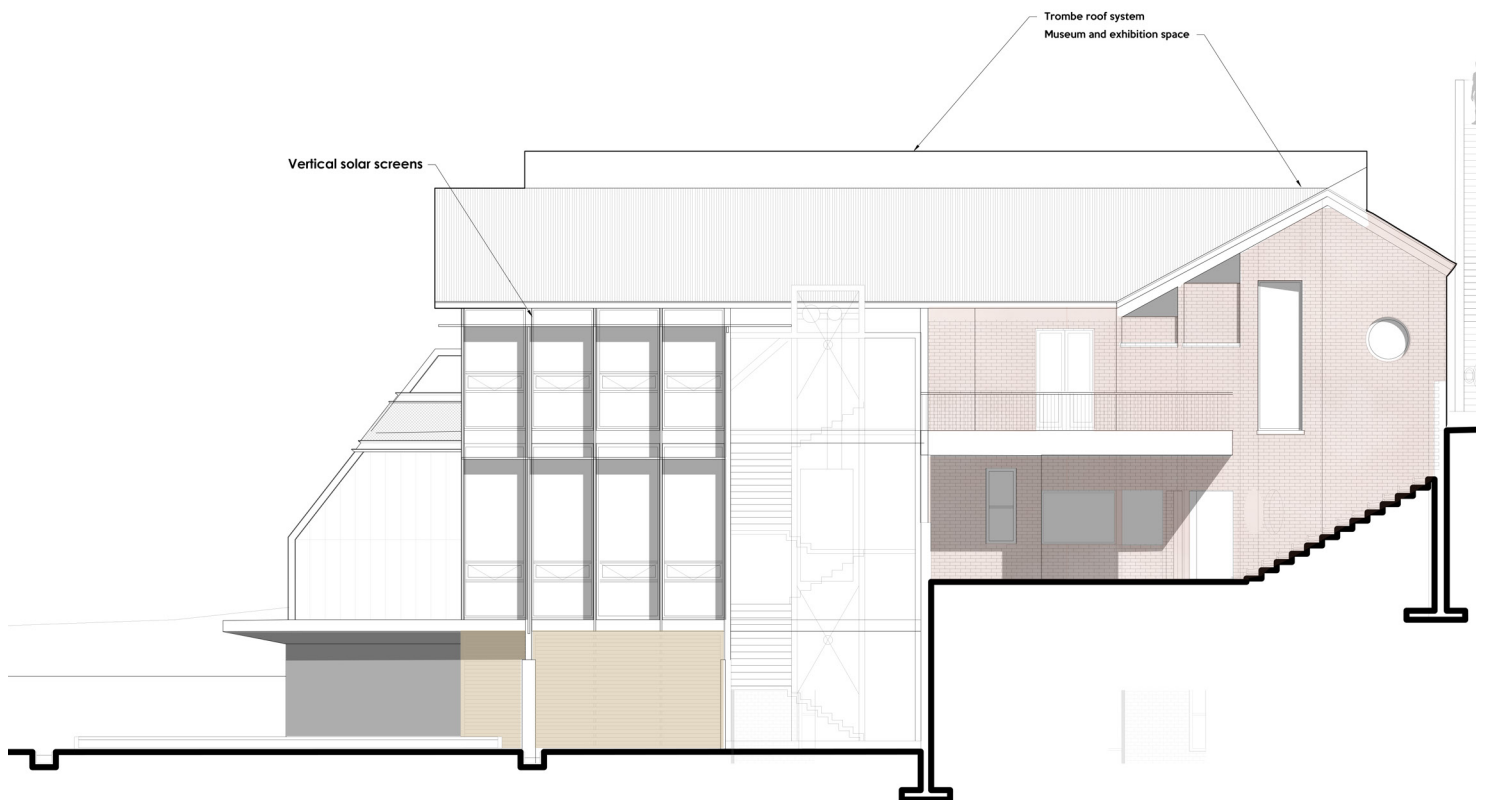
Northwestern elevation. scale 1:200 (Author, 2017)
